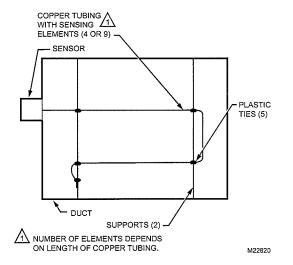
Duct cross section showing method of installing C7021R, C7023R, C7041R Averaging Electronic Sensor.
